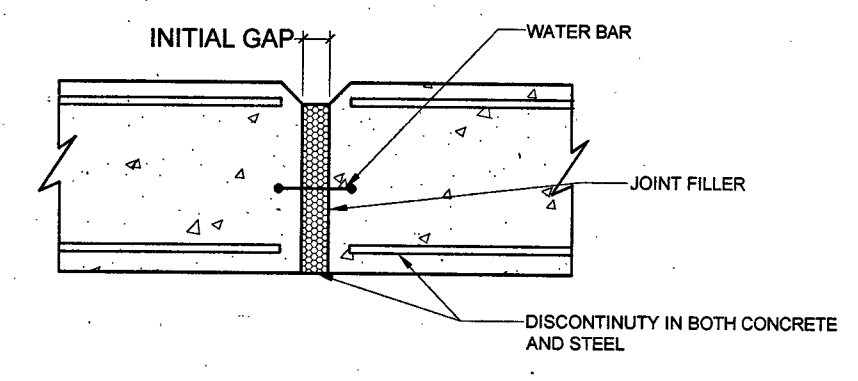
EXPANSION JOINT SUBJECT TO WATER PRESSURE
